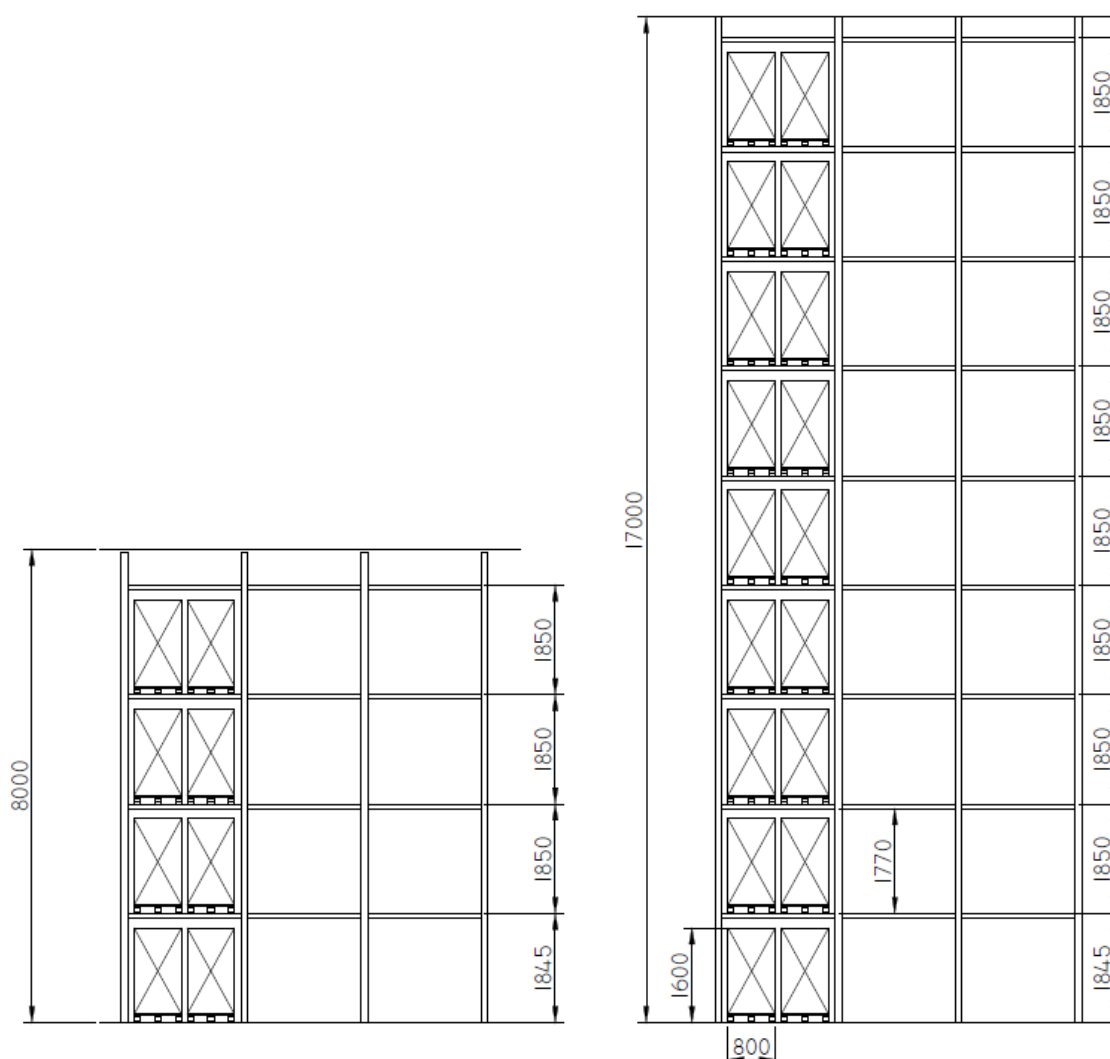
Presentation of pallet stacking - through standard rack warehouse (left) and high bay warehouse (right)
